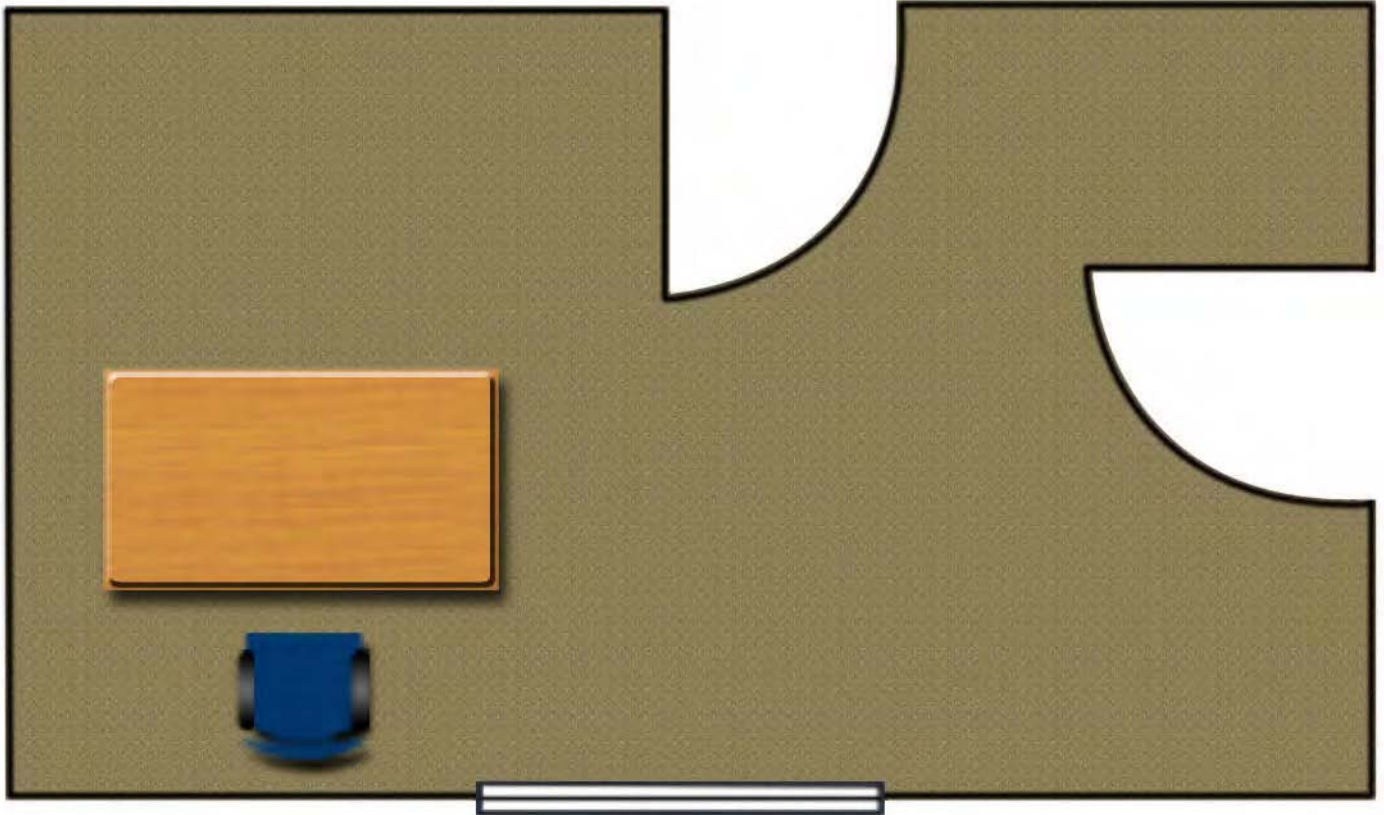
3rd Floor Monitoring Room (adjacent to MC Room)
